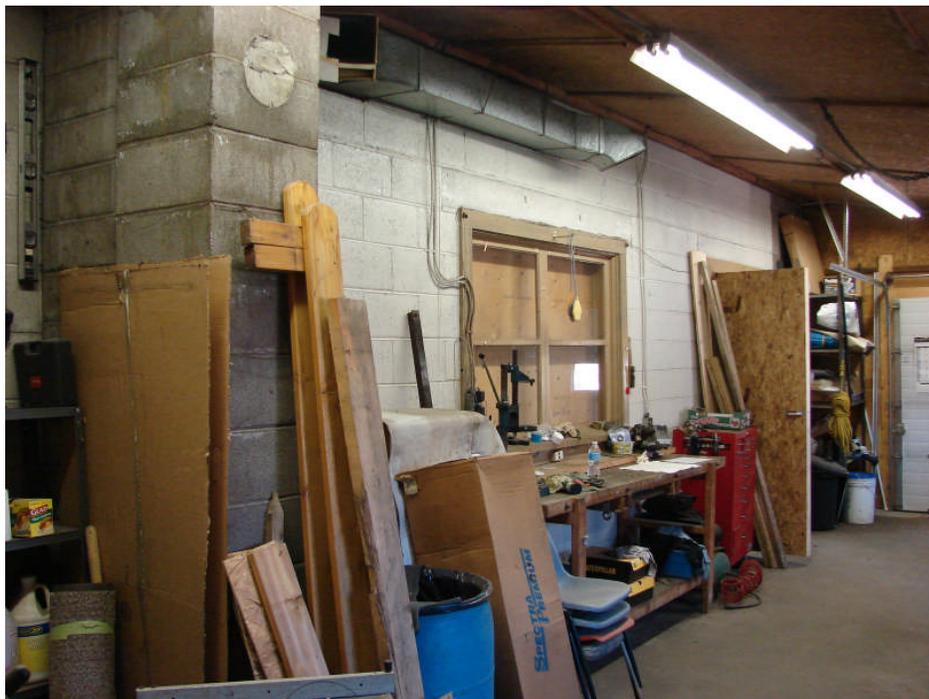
Garage Building west wall – concrete block wall step cracking at door near north end, typical.
